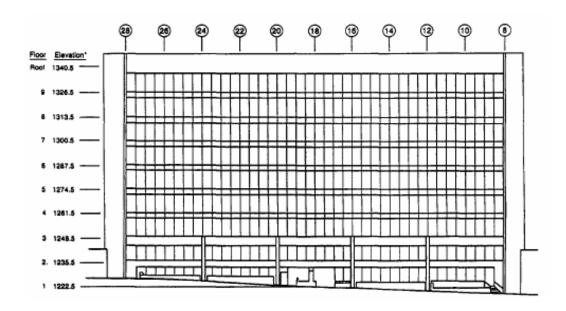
North Elevation View of the Murrah Building. [21] Note the four main columns and the $3^{\rm rd}$ floor transfer girders.
